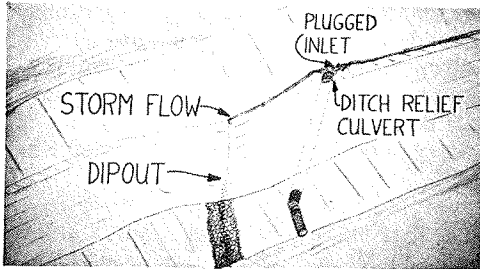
Deeply scoured ditch caused by failure of ditch relief culverts.
